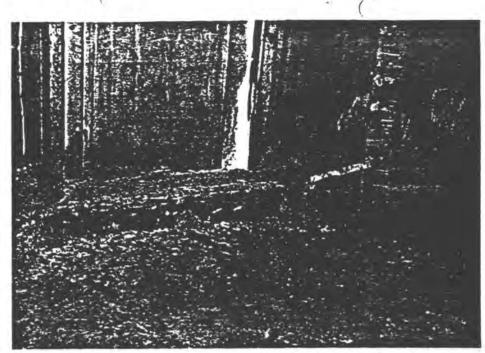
Depicts repairs made to broken curb at outside door on south wall of drum storage warehouse as seen on 1/7/86. Concrete seemed crumbly and rough as if it was mixed wrong or applied in freezing temperatures. It did not appear adequate to retain liquids. Taken at Rose Chemicals, Holden, MO.
